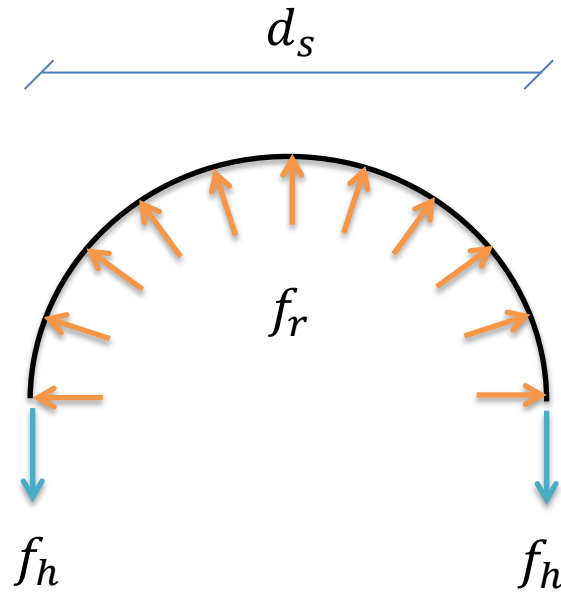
Radial Stress in Hollow Circular Columns with One Layer of Transverse Reinforcement
